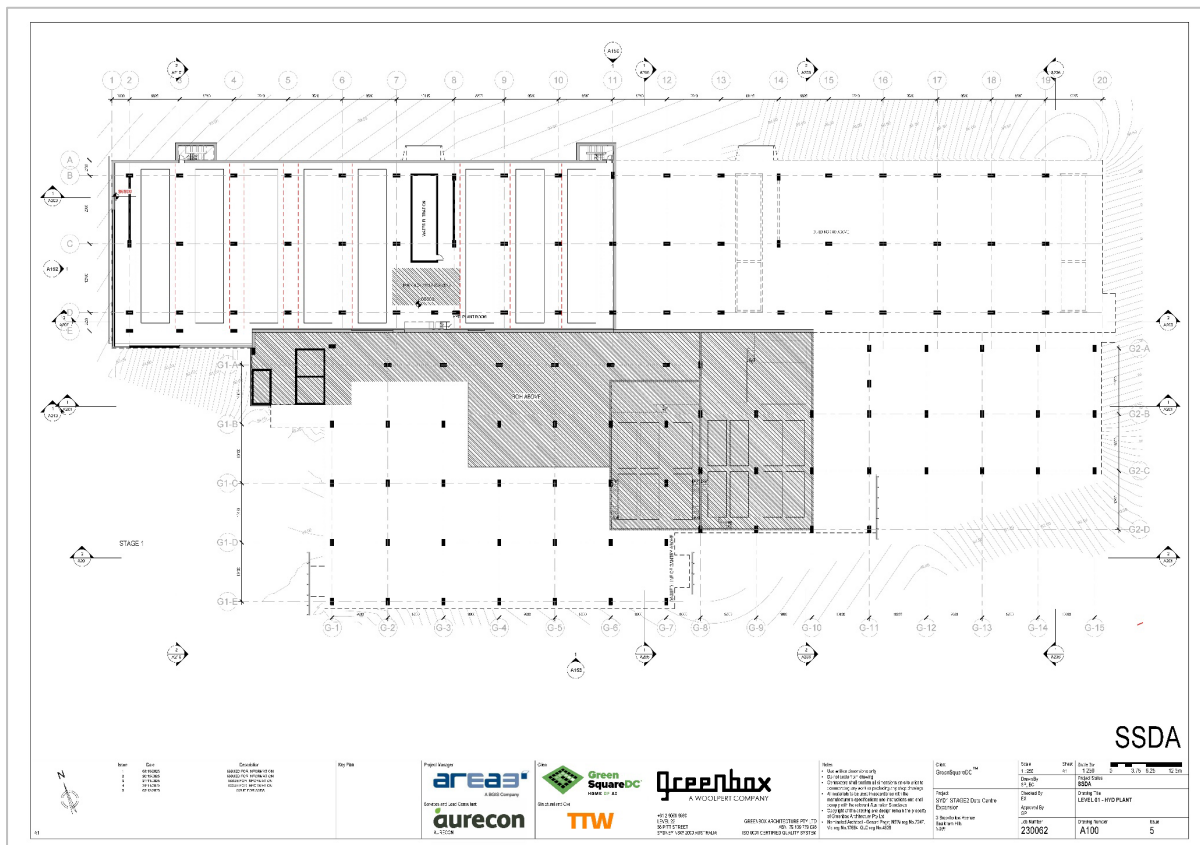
BOH Floor Plan (Source: Greenbox. 2025).
